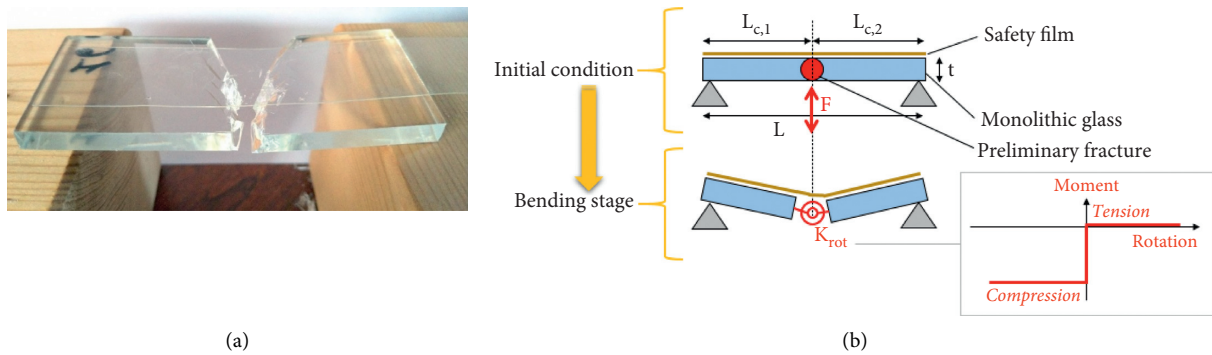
Vibration tests on fractured sample: (a) typical specimen and (b) schematic setup.
